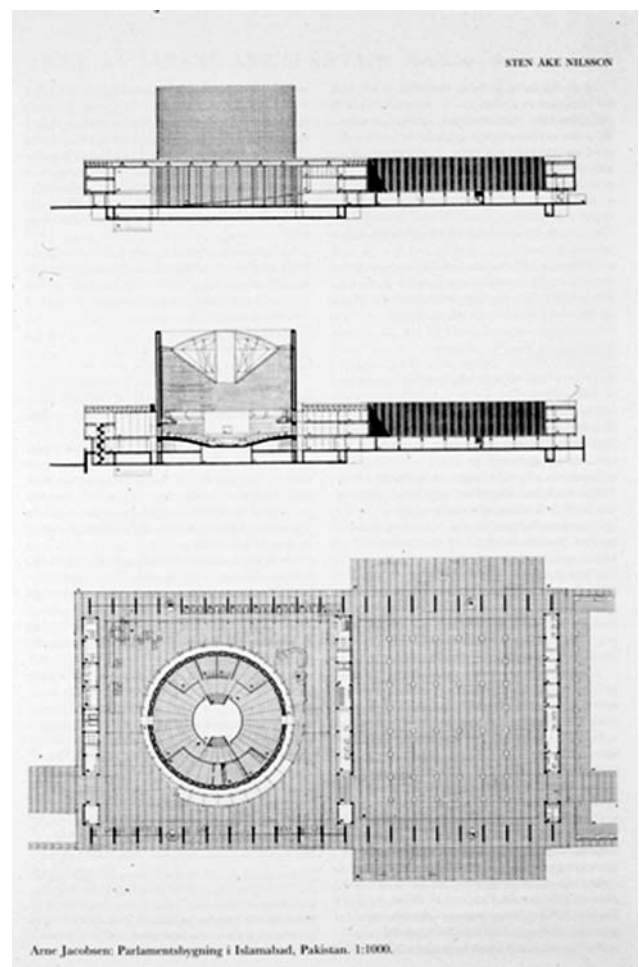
Plan and Section of Parliament building designed by Arne Jacobsen. (Drawing Credit: Sten Nilsson)
